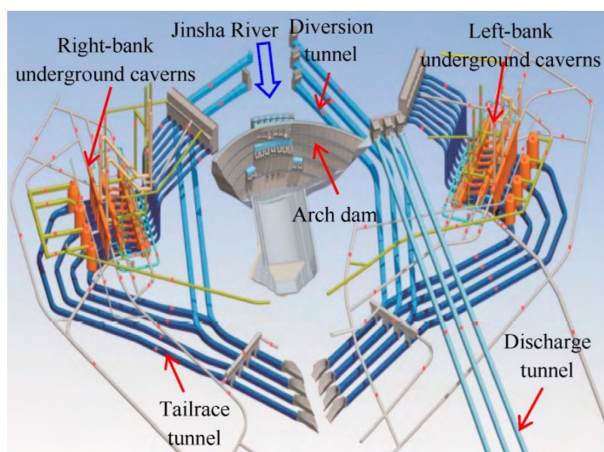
Layout of the Baihetan underground works (Ding et al., 2024).
